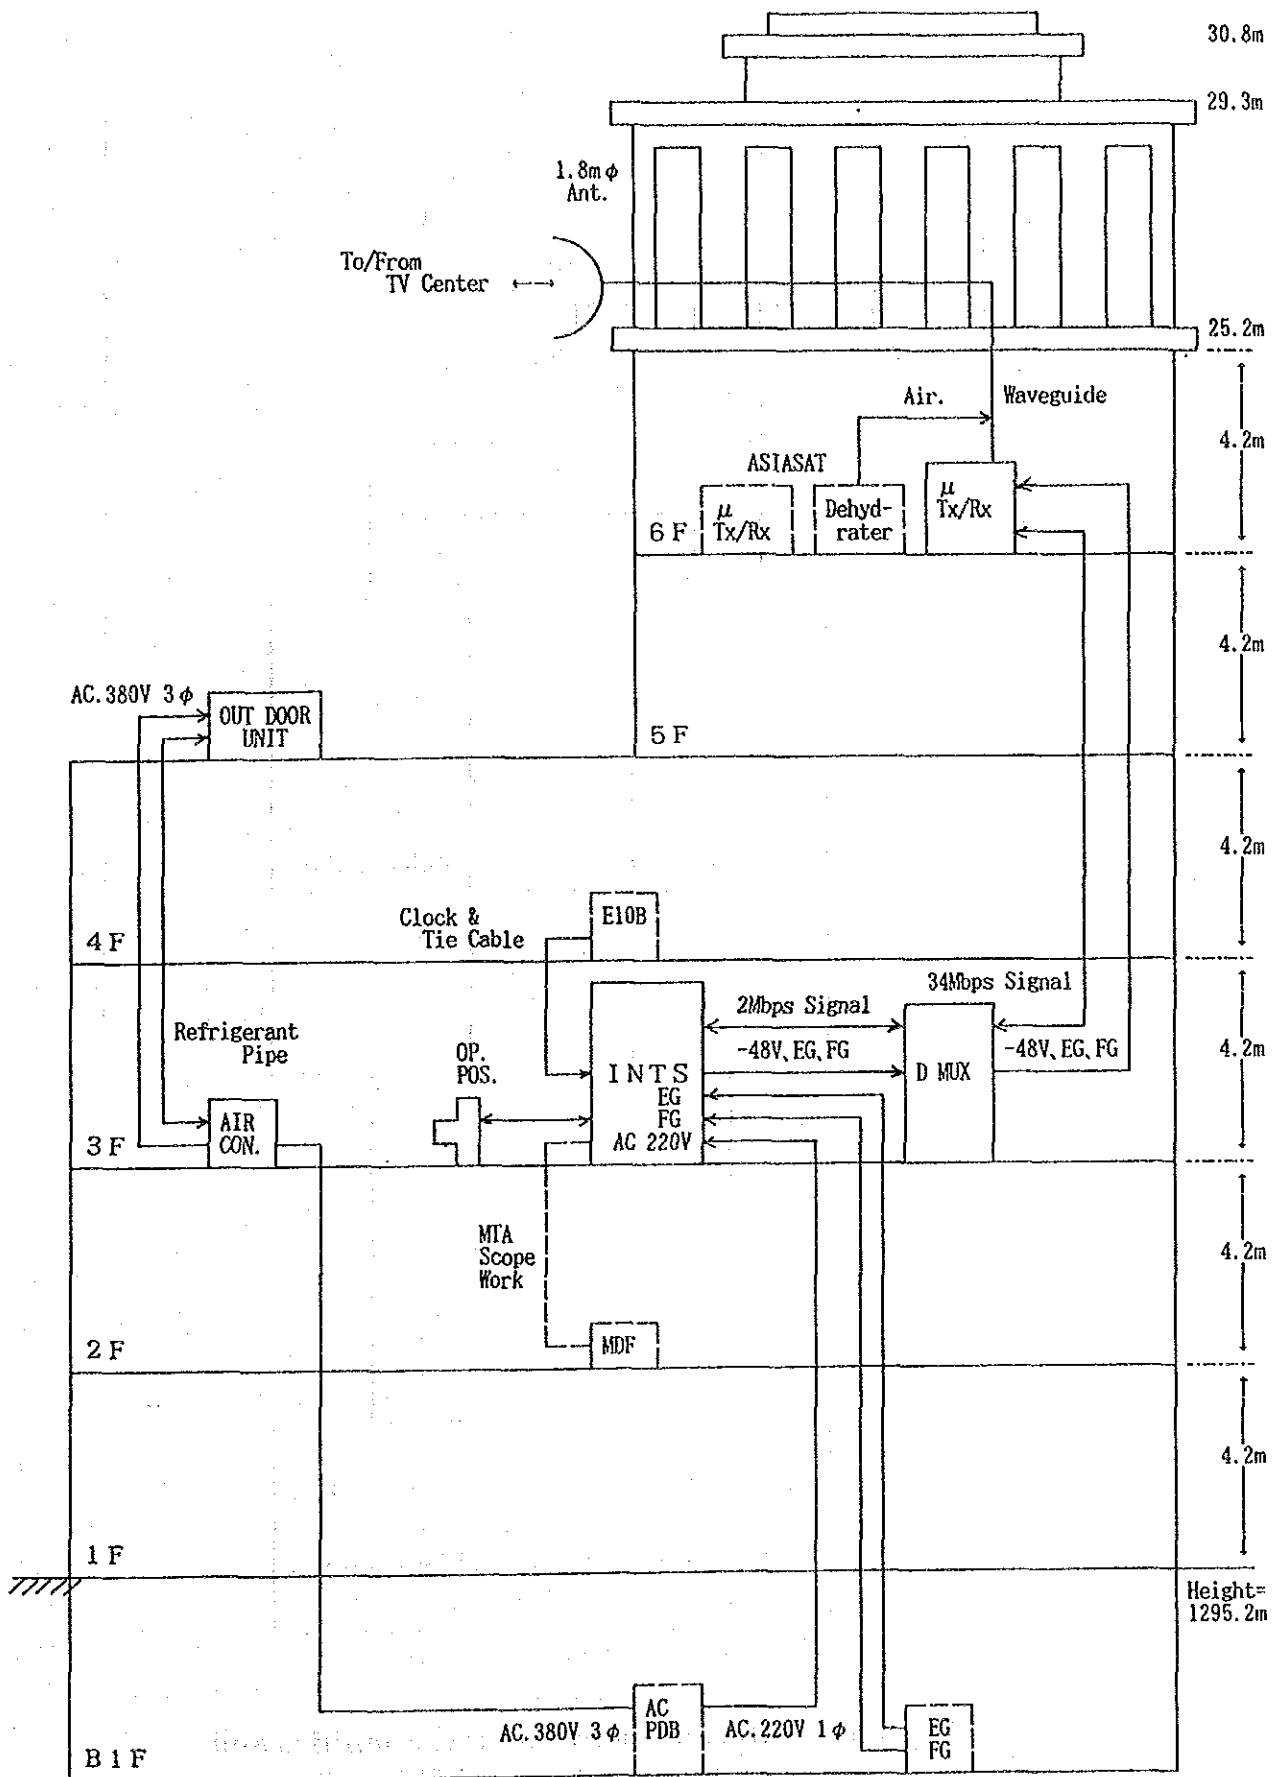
Interface between New Facilities and Existing Facilities in Central Office of MTA
